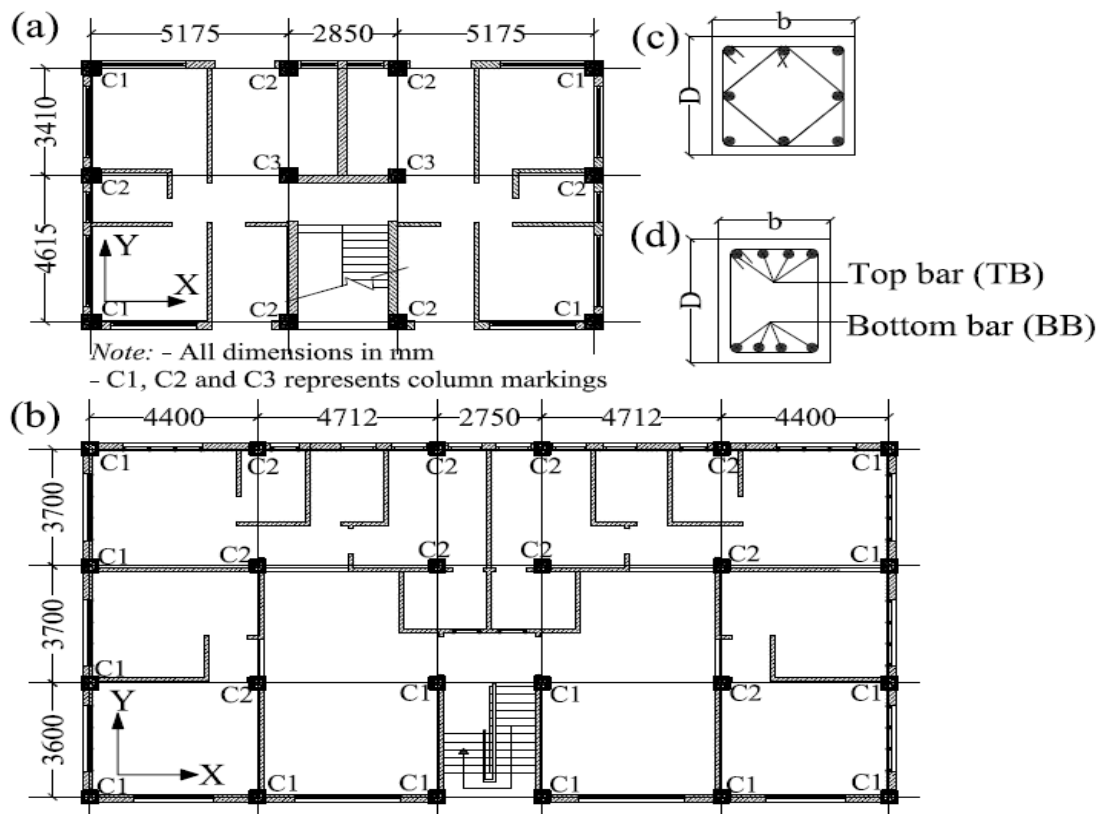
Masonry wall and column layout plan for (a) 6 storey; (b) 3 storey; (c) typical column cross section and (d) typical beam cross section.
